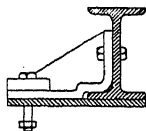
Extension of Girder Flange to obtain Fixing.
